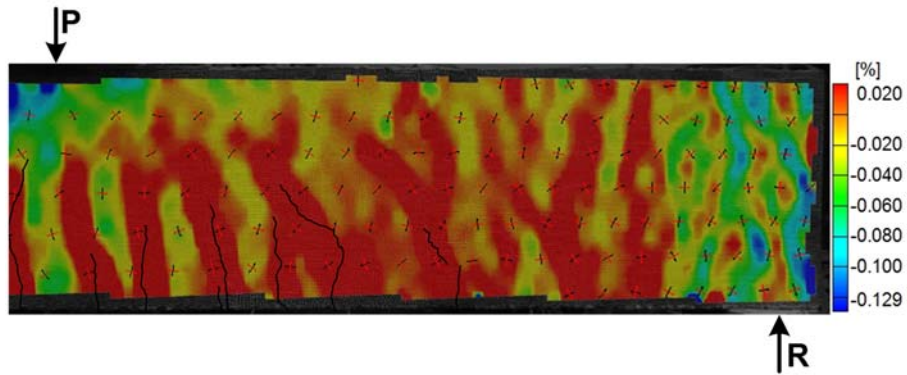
Scaled full-field concrete longitudinal strain ( $\epsilon_x$ ) across shear span for specimen RC18b at load 35 kips
